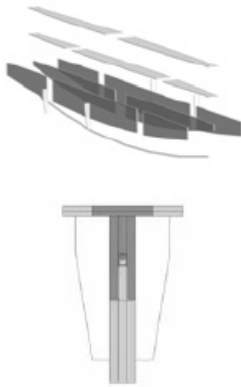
Design of reinforced, post-tensioned, T-shaped glass beam.
